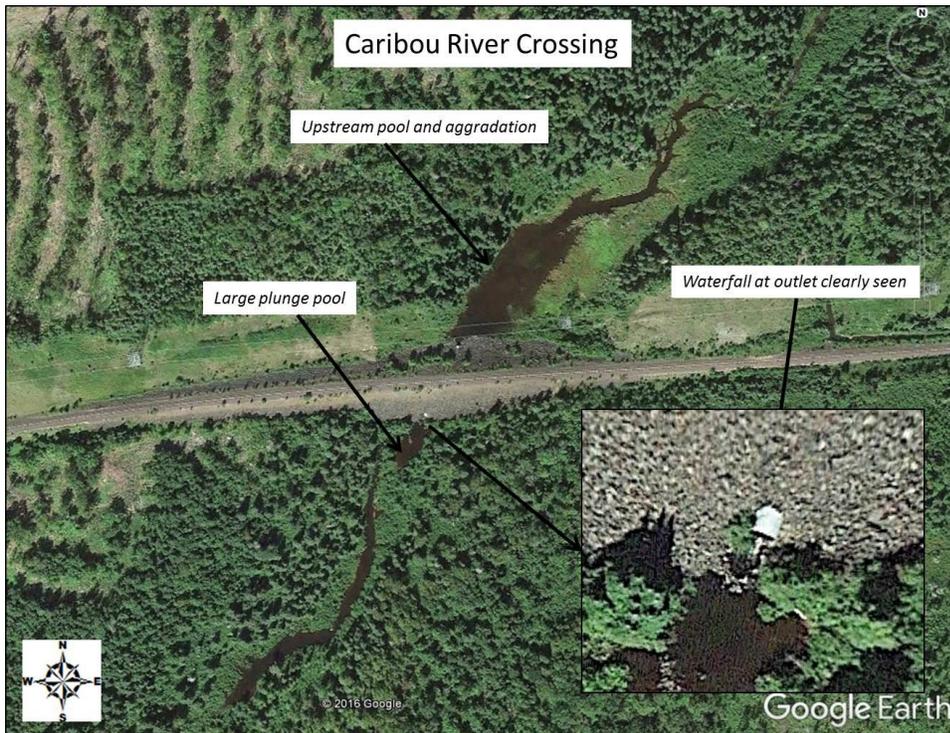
Aerial photo of Caribou River RR crossing, showing large plunge pool, visible waterfall at outlet, and large ponded area upstream
